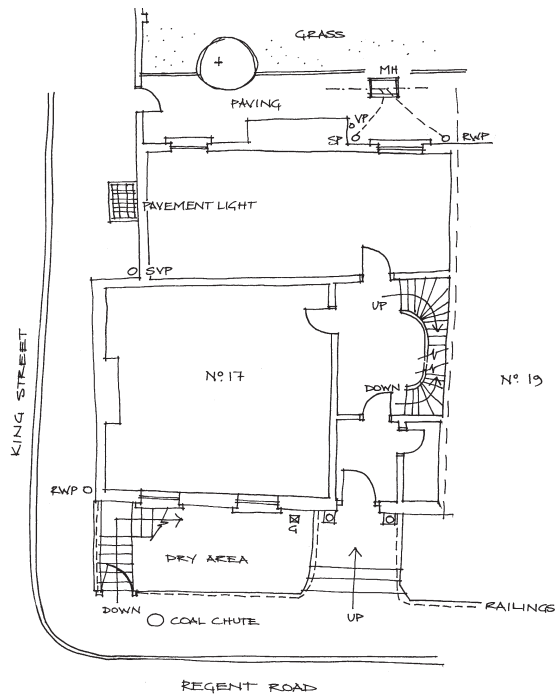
(b) Ground floor plan. Stage 2 internal layout added.
